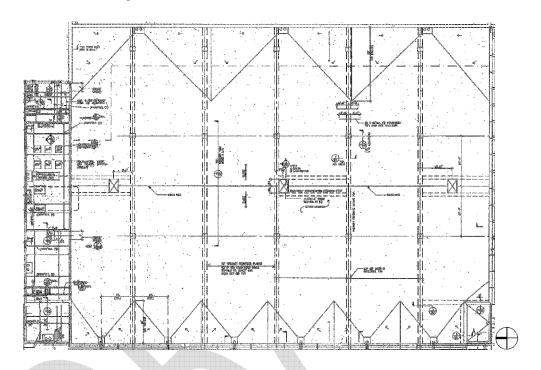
Roof Framing Plan, 1994 Construction
